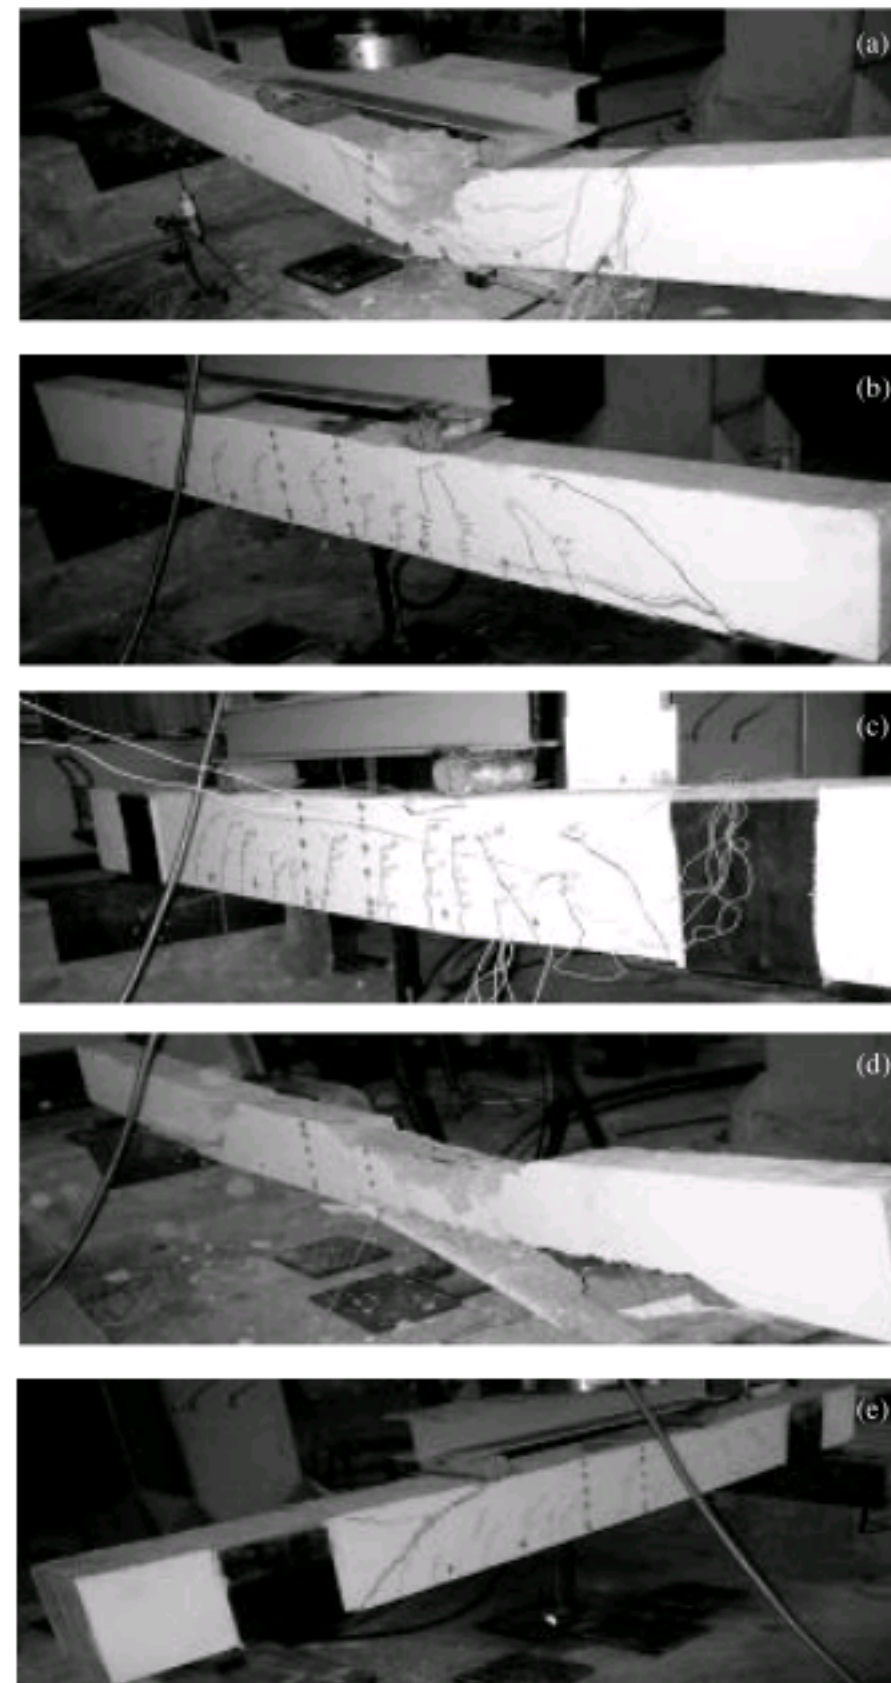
Failure mode of the r.c. beams tested. (a) Beam B1: control beam, (b) Beam B2: Steel plate strengthened beam without end anchorage, (c) Beam B3: Steel plate strengthened beam with end anchorage, (d) Beam B4: FRP laminate strengthened beam without end anchorage and (e) Beam B5: FRP laminate strengthened beam with end anchorage
